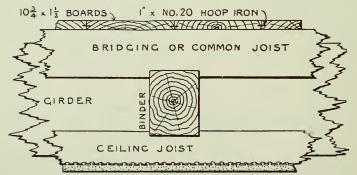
Section through Binder of Framed Floor with Ploughed and Tongued Boards.
